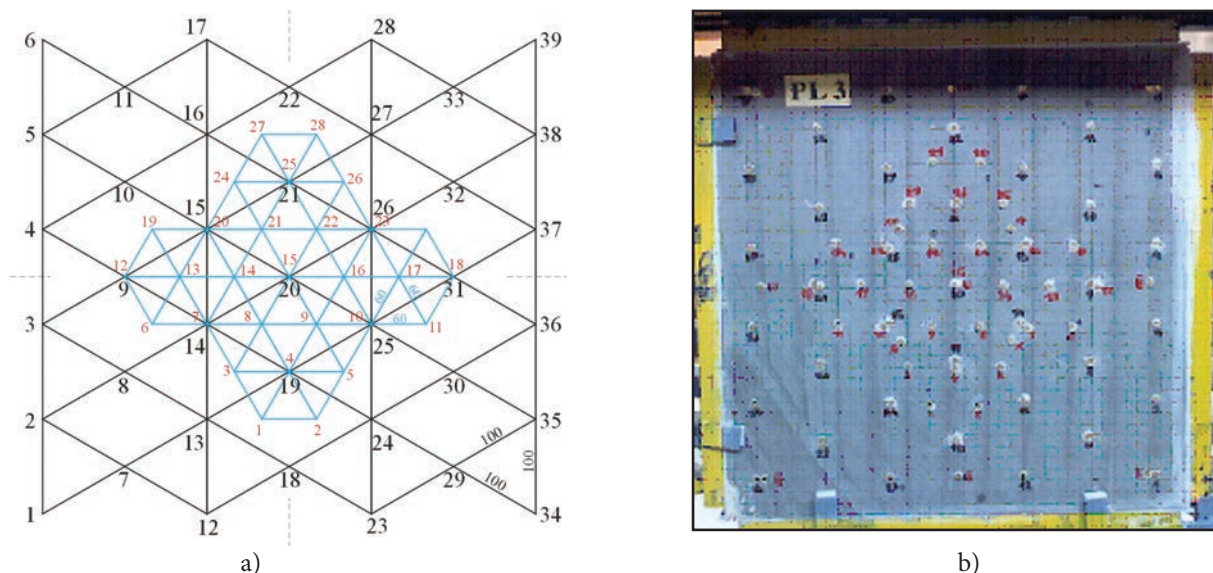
Plate specimen: a) scheme of measuring spots; b) specimen equipped with measuring bases.
